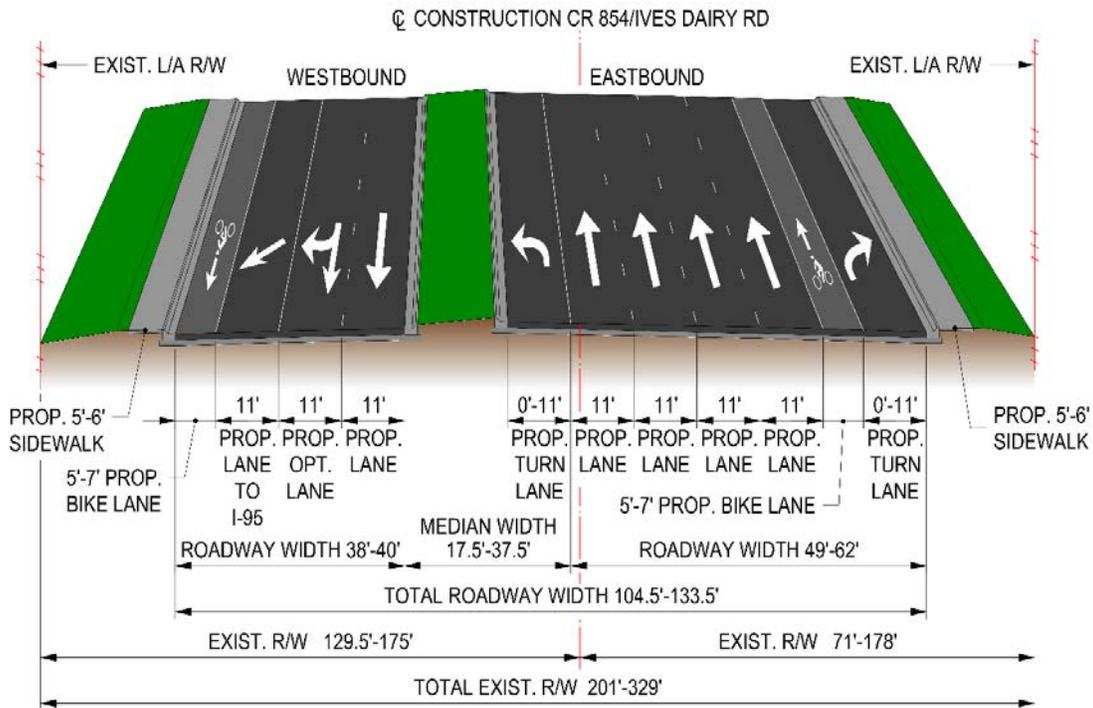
10: Proposed Typical Section - Alternative 2 – CR 854/Ives Dairy Road
